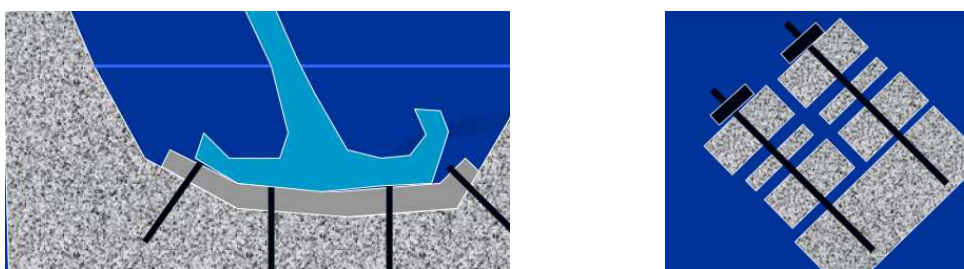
Concrete lining (left) and rock anchoring (right) [64]
